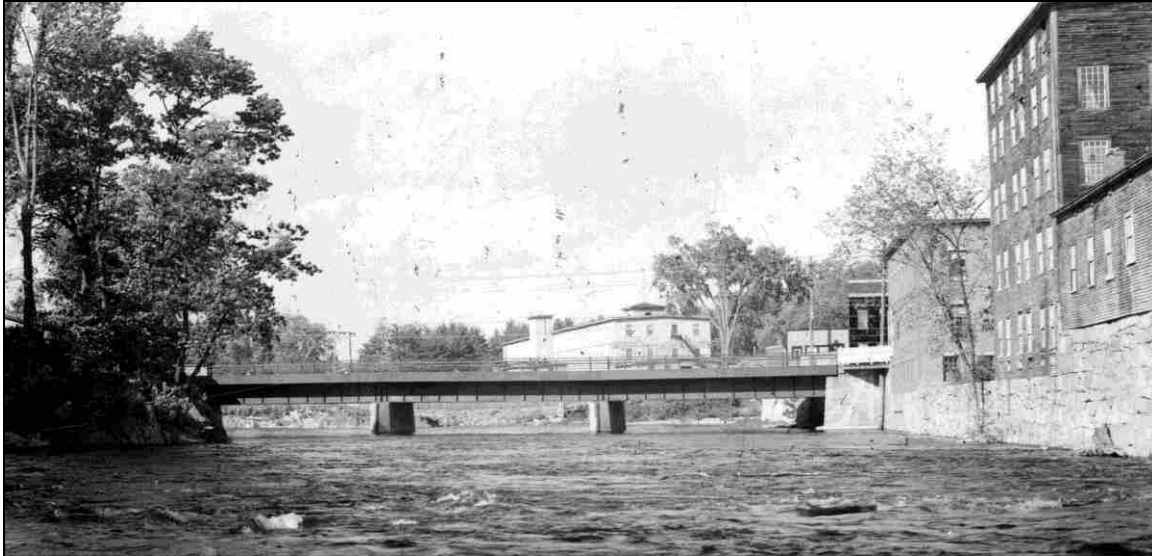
Main Street Bridge Penacook, built 1915. Upstream side, photo dated June 12, 1940 (NHDOT bridge card Concord 040/090).
